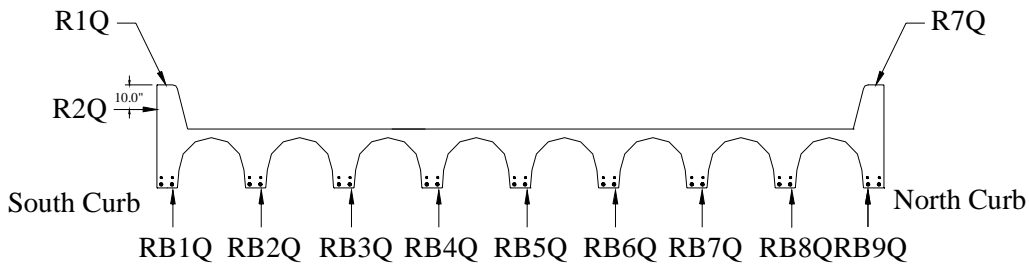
Exact Location of Curb Gages and Reinforcing Bar Gages at Quarter-Span
